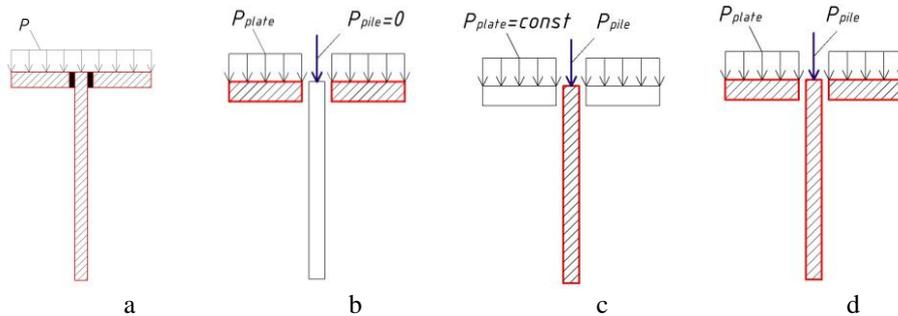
Layout of load combinations of pile foundation elements: a – 1st test; b – 1st stage of IInd and IIIrd tests; c – 2nd stage of IIIrd test; d – 2nd stage of IInd test and 3rd stage of IIIrd test
